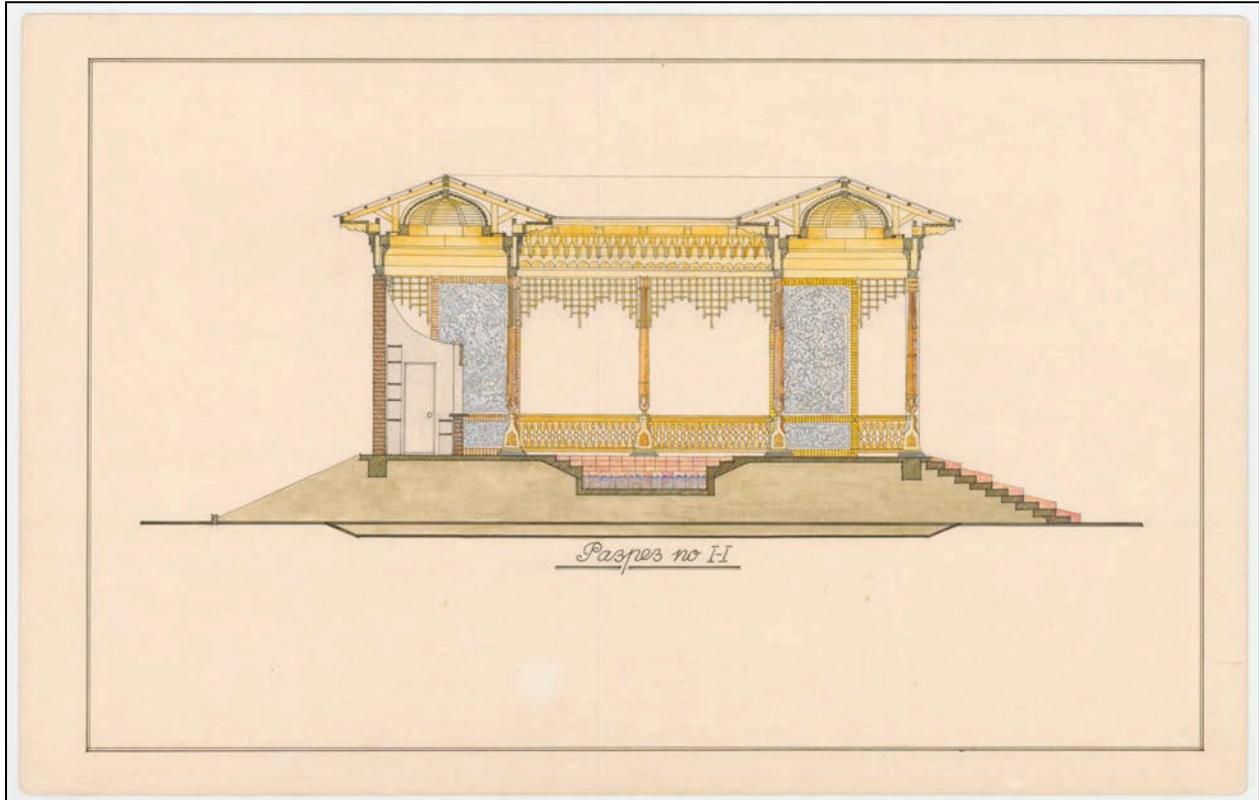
Boulder-Dushanbe Teahouse: Original Building Section, Lado Shanidze, 1988
